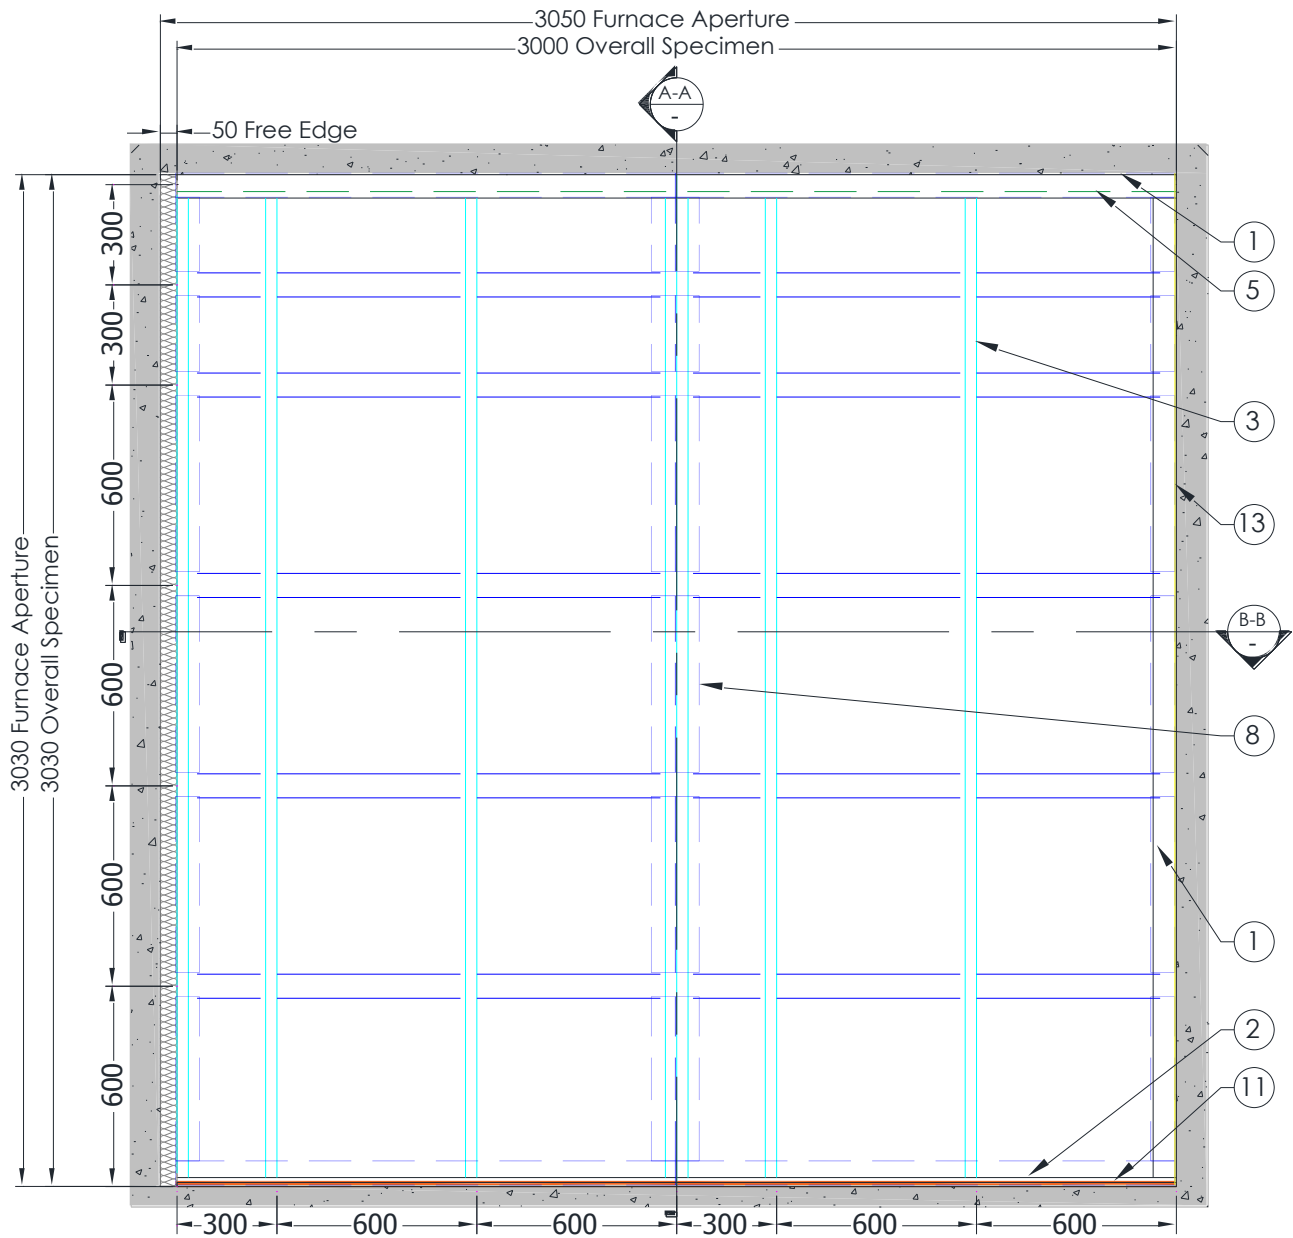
General Elevation / Section Showing First Layer of Plasterboard – Unexposed Face
